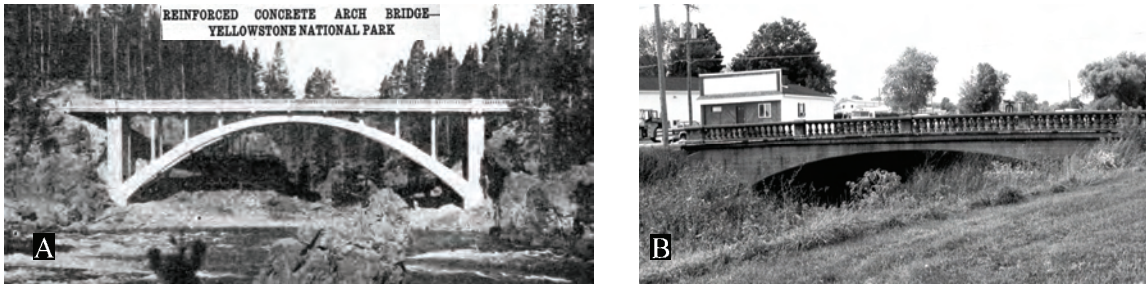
A. Bridge built by Stark Company in Yellowstone (*Transit* 1916:42; *Levan* 1916:40). B. Stark's ca. 1917 concrete arch bridge with handrail, West Union, Fayette County (2003 survey photo).
